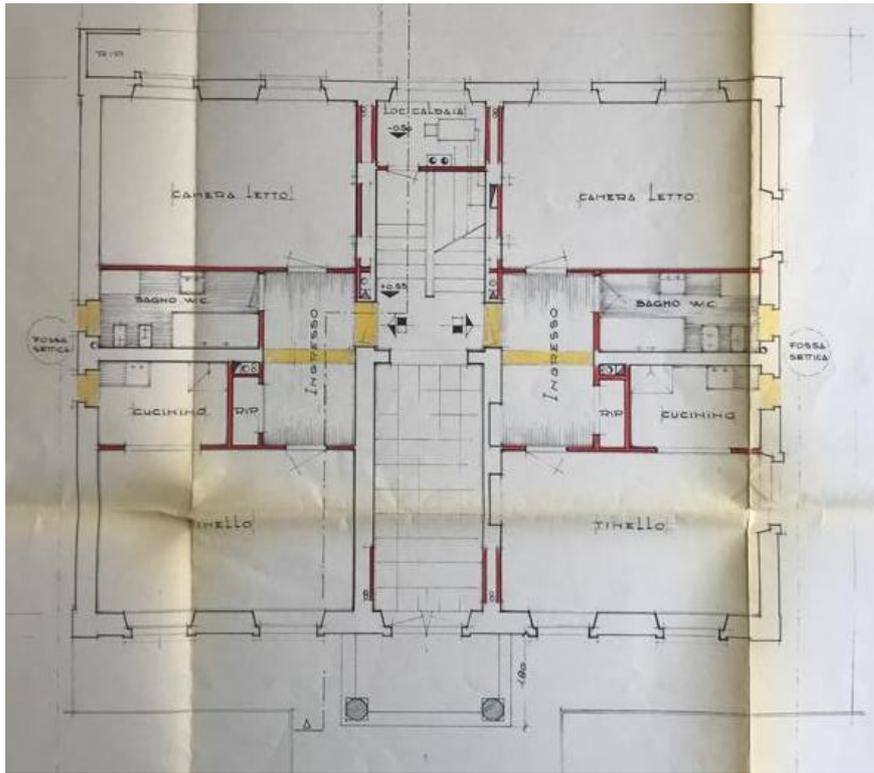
Ground Floor Plan (Via Stazione 30)
